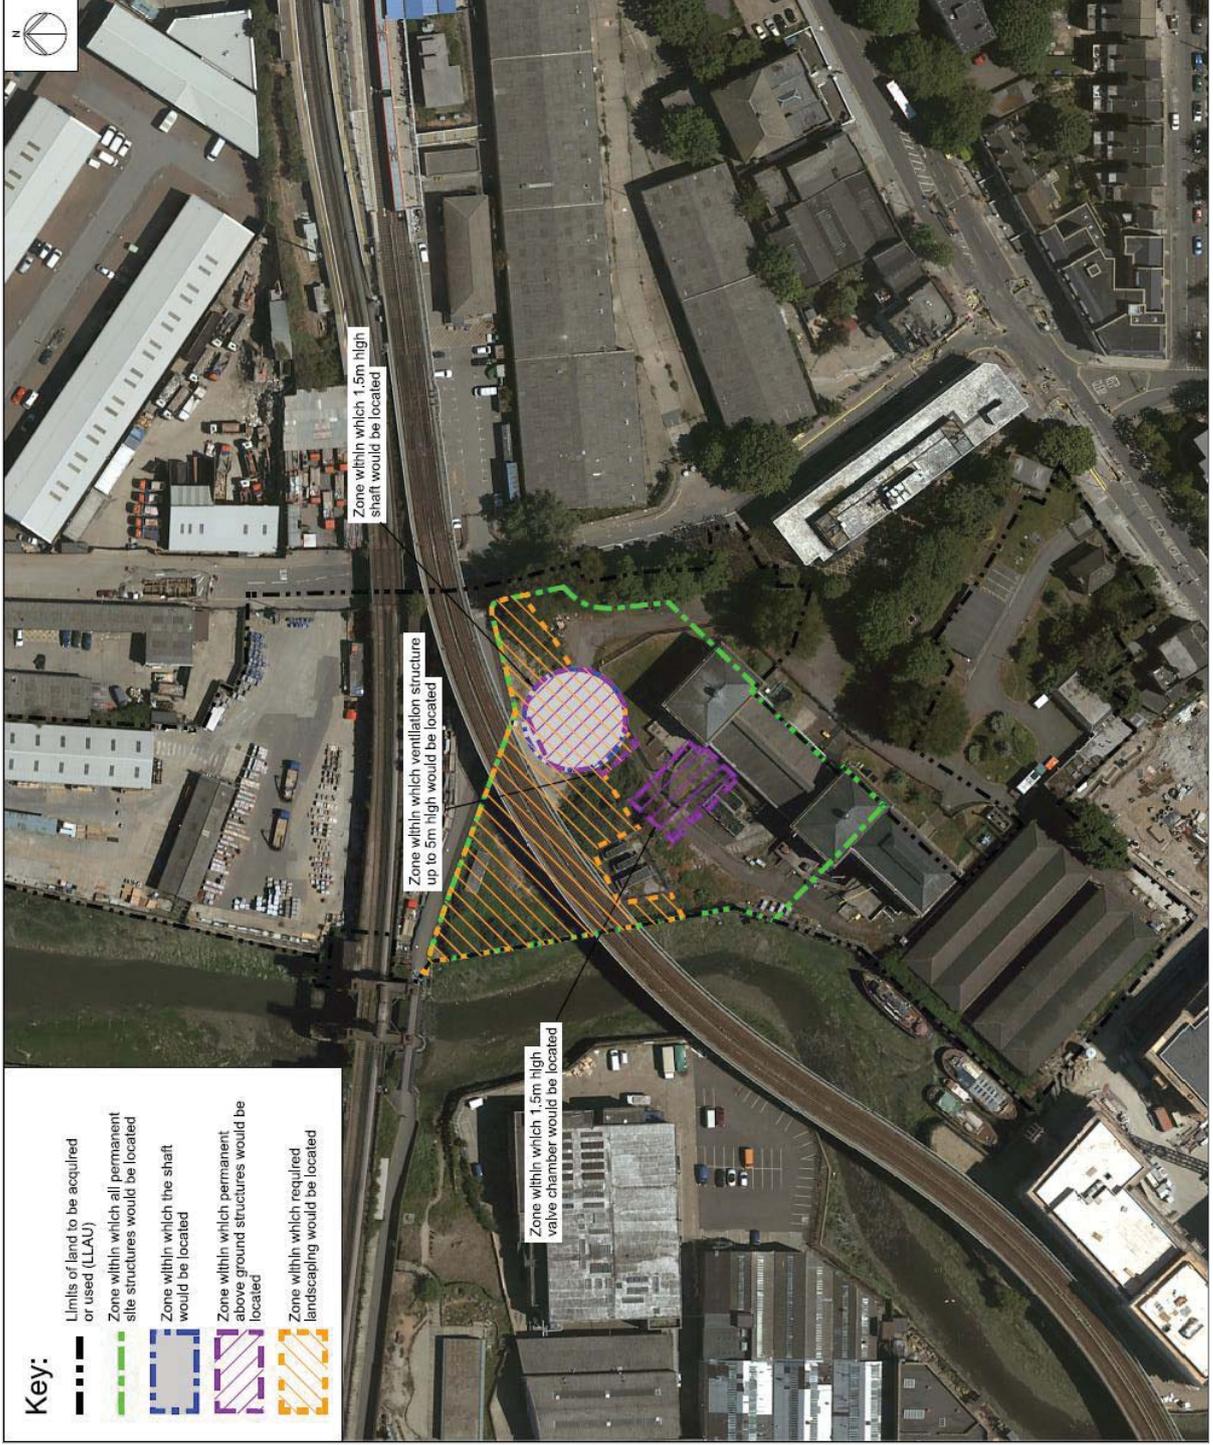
Schematic layout at Greenwich Pumping Station site
